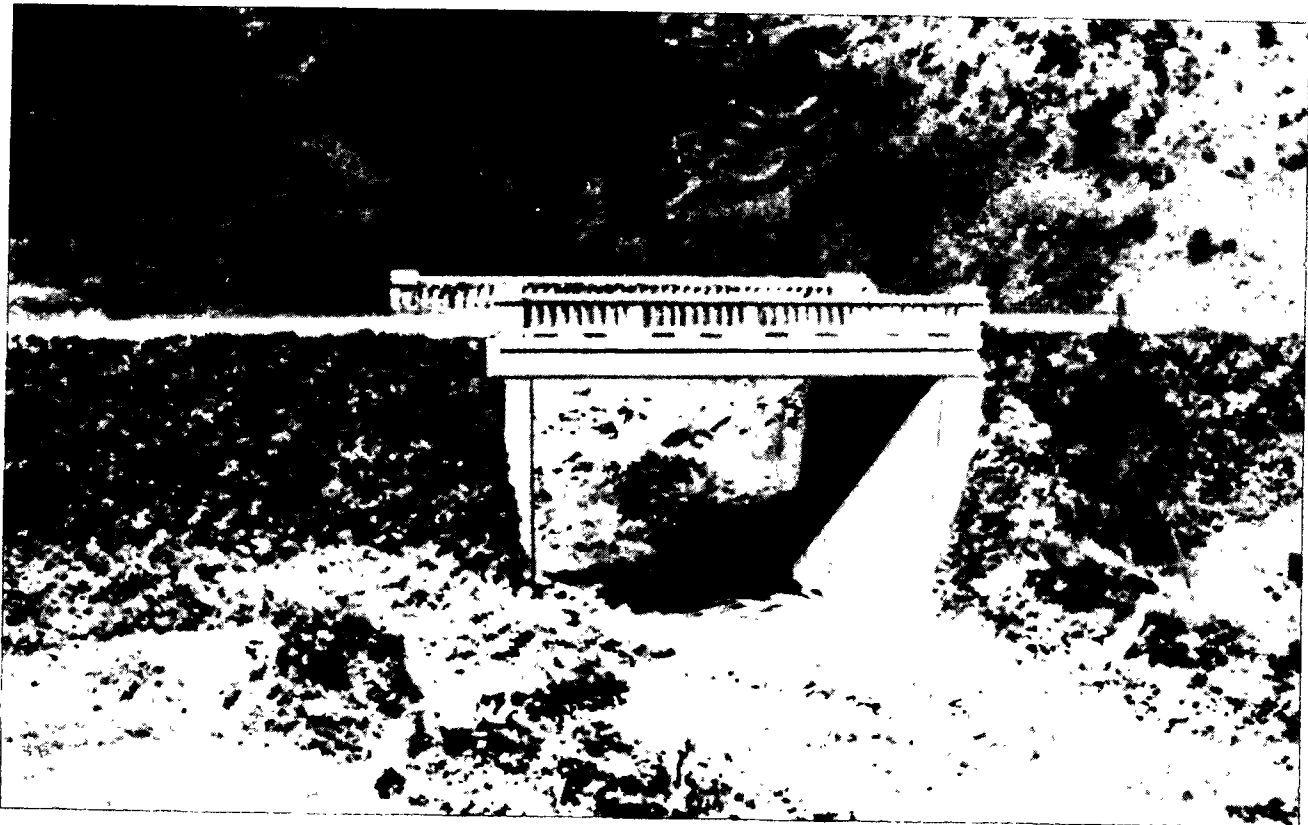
Simple stringer bridge with steel I-beam stringers and timber flooring.
